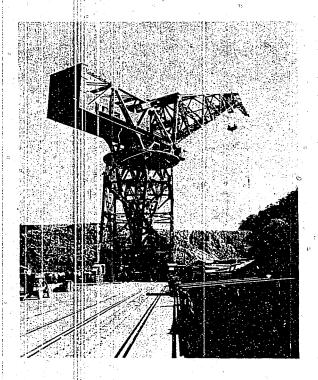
DETAIL OF TOWER CRANE AT NO. 6 DRY DOCK
